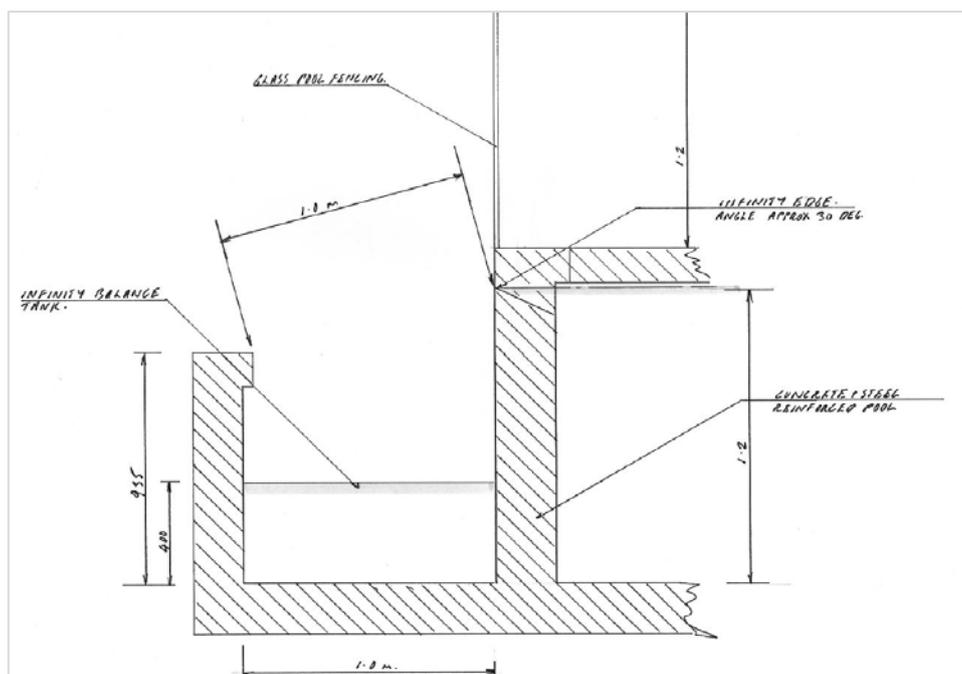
Balance tank and infinity edge as constructed – sketch from agent
